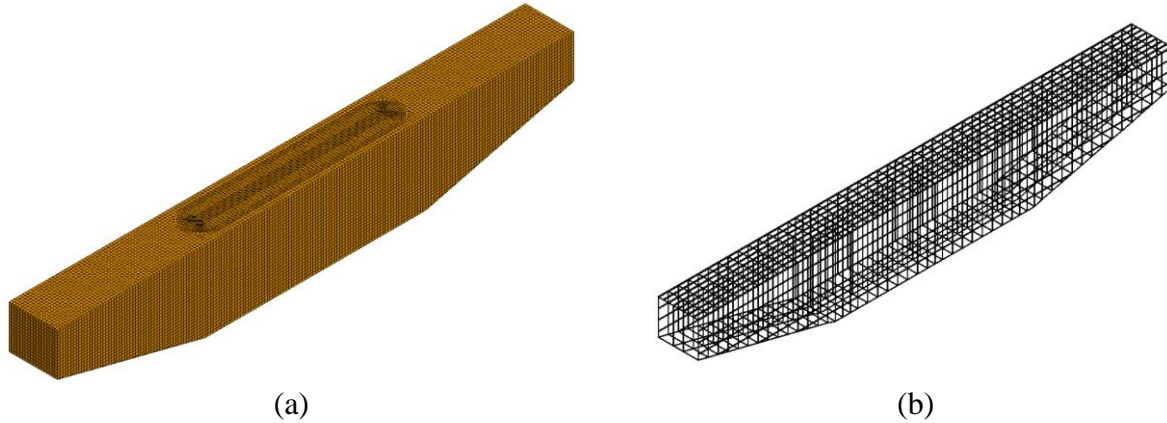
Details of the T-pier's bent cap: (a) concrete and (b) steel reinforcement
